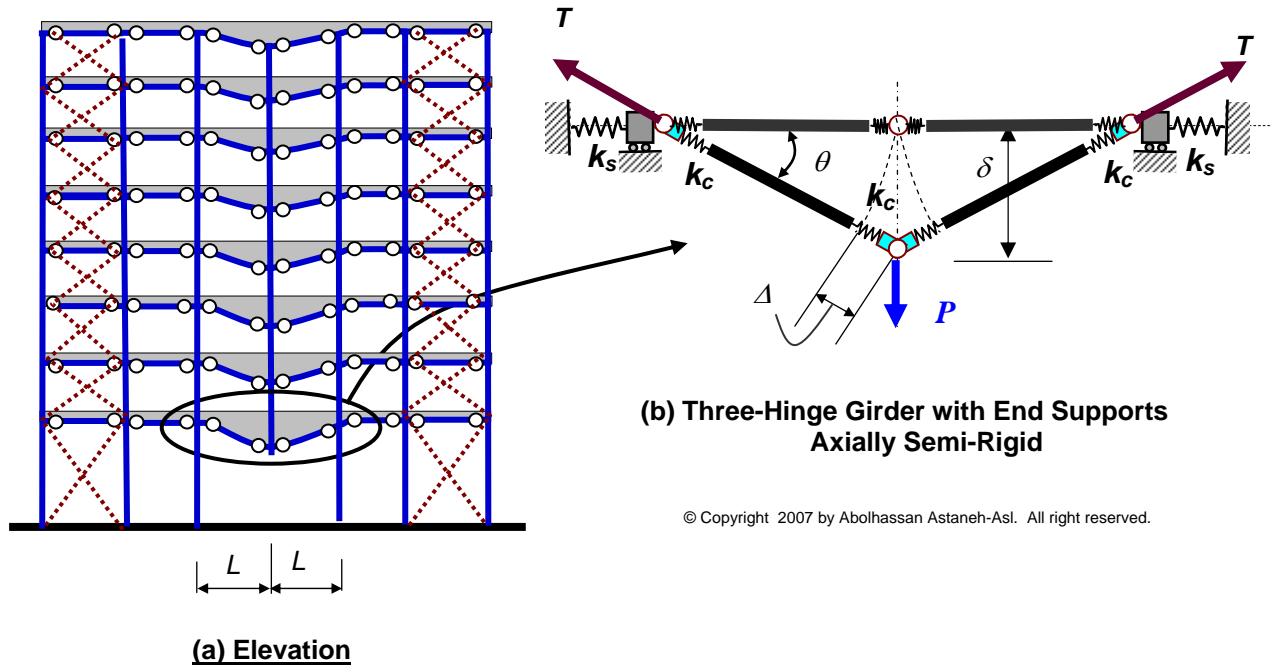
Beam Collapse Mechanism and Development of Axial Catenary Force, T , in Frames with Shear Connections
